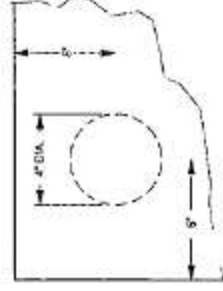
INSTALLATION WITH KWIK CONNECT WALL ELBOW
